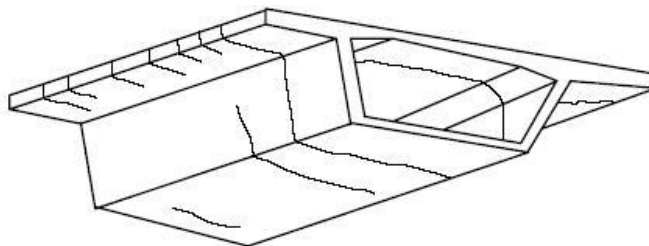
Box Girder Cracks Induced by Direct Tension
